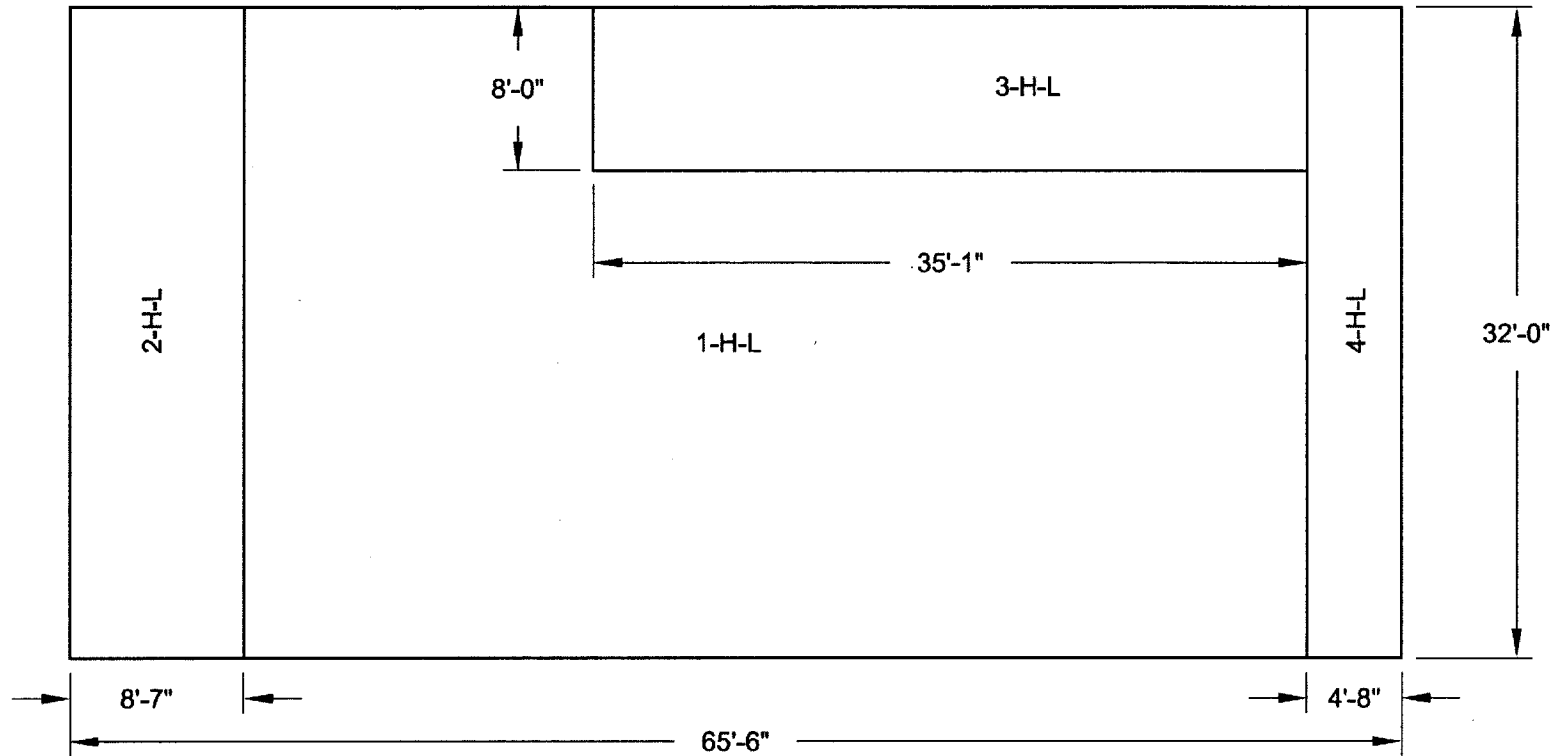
H.6-147 Roof 2 Looking Down Horizontal Reinforcement Zones
